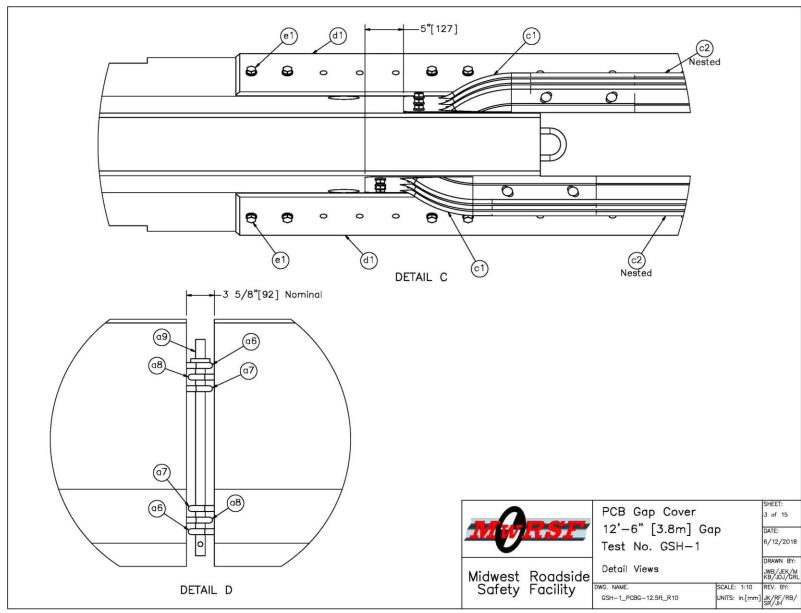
Detail C and Detail D Views, Test No. GSH-1
